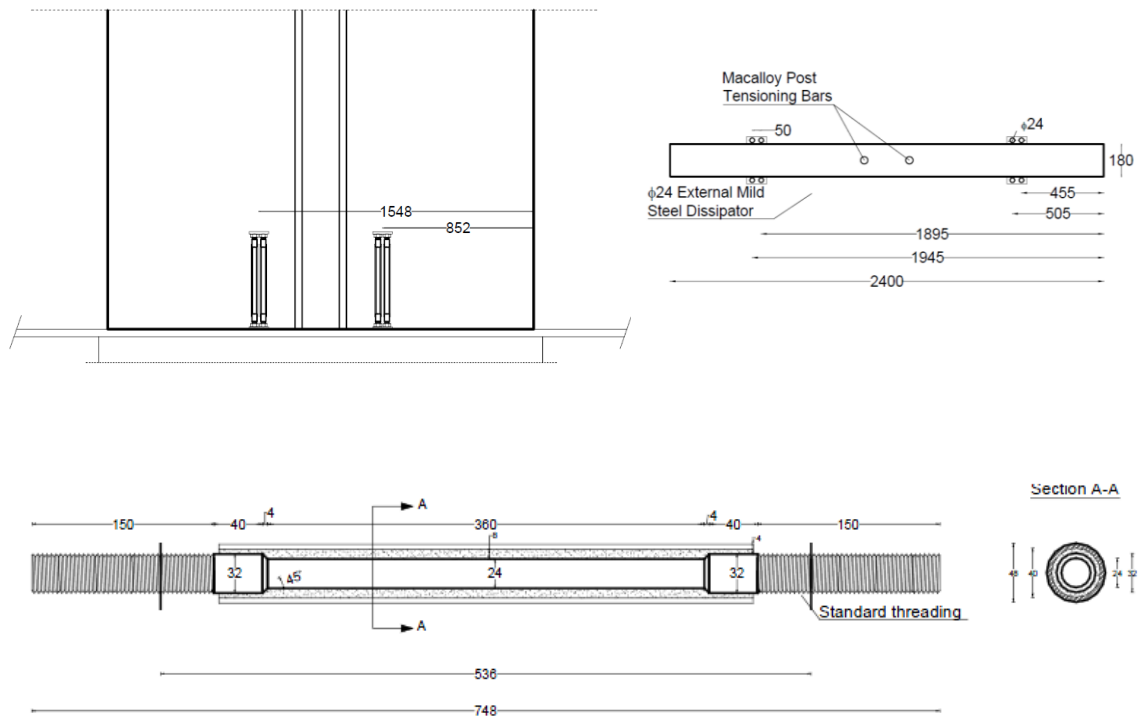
Post Tensioned Wall Sections with D24 External Mild Steel Dissipators
